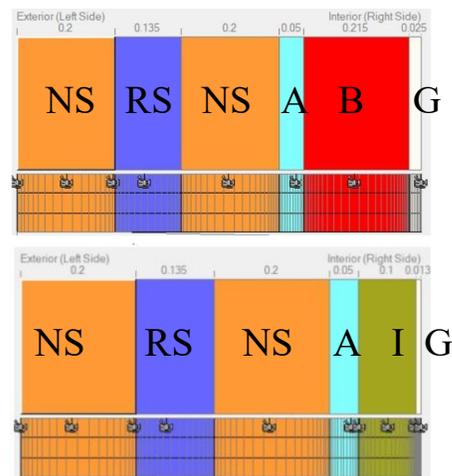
Baseline existing wall type 2 (top) and Retrofit 2 (bottom) wall compositions and monitor points (indicated by grey camera icons). NS – Nepean sandstone, RS – rubble stone, A – air gap, B – brick, G – gypsum board, I – insulation.
